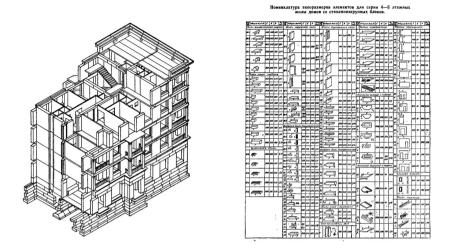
Massive concrete blocks building (*Kievproekt*, 1955): constructive view of the standardized 5-storey building (left) and nomenclature of elements [Vasiliev, 1957]. Source: *Large-block Construction in Leningrad (Крупноблочное строительство в Ленинграде)*, edited by Boris Vasiliev, Leningrad: Stroyizdat, 1957, p. 30, 31.
